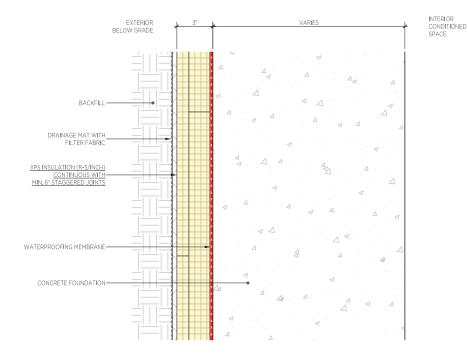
Base case - Foundation wall Figure 3.9b: Passivhaus Proposal - Foundation wall
